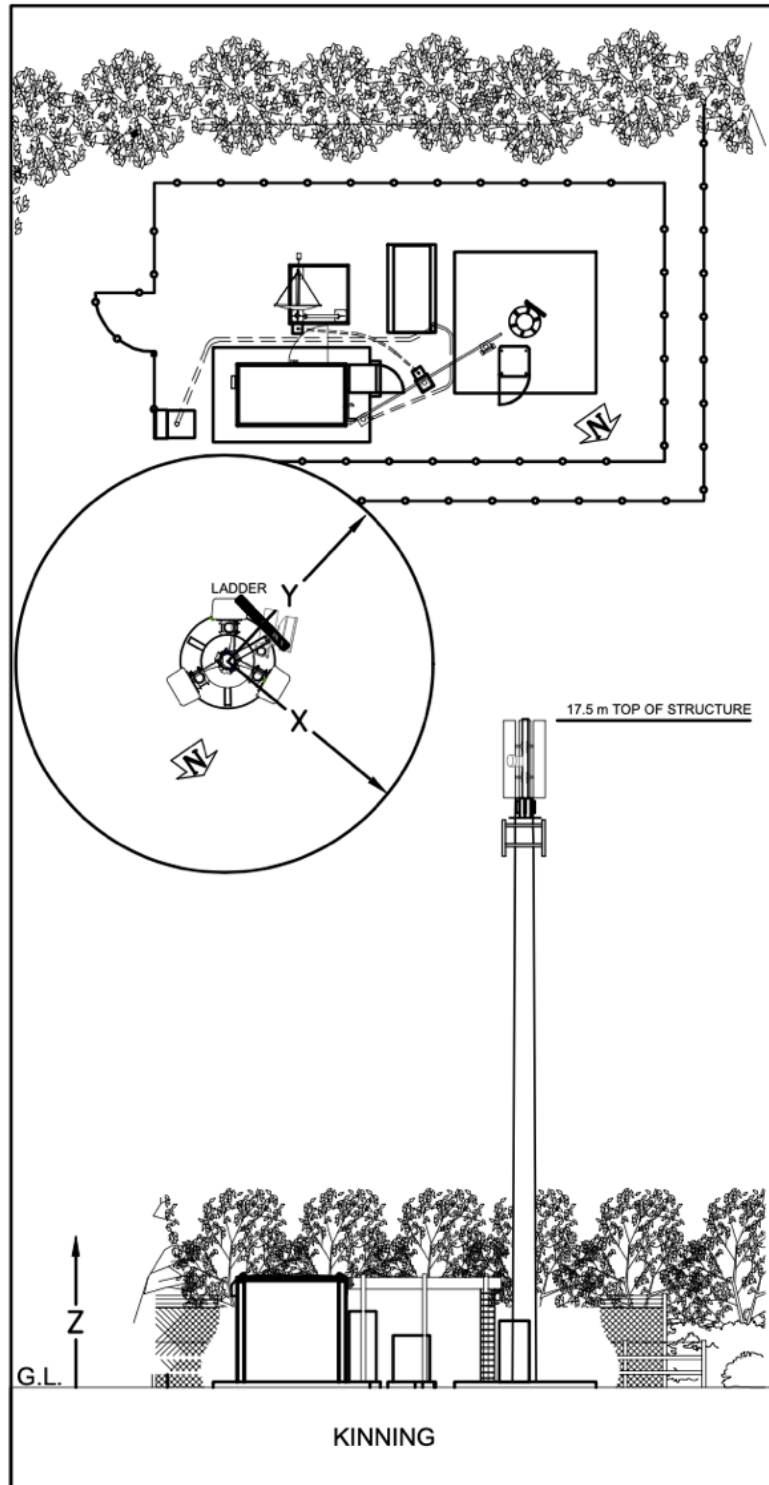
Elevation and plan view of surveyed site: Kinning monopole.
